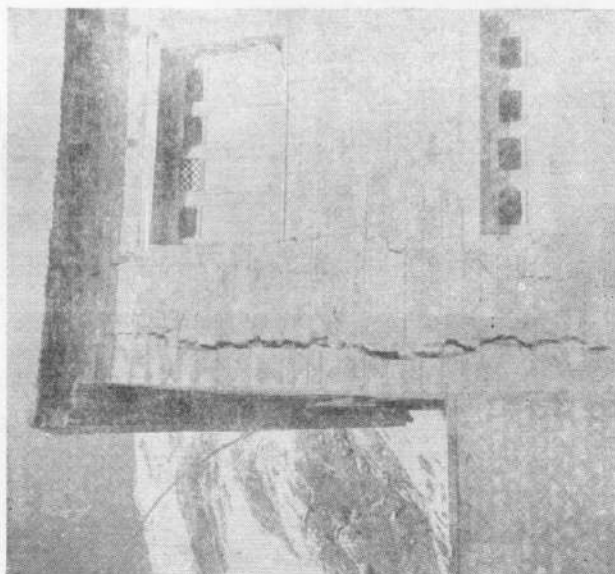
Bulging of walls due to cracks from roof to floor level on the police station building at Leo village.
